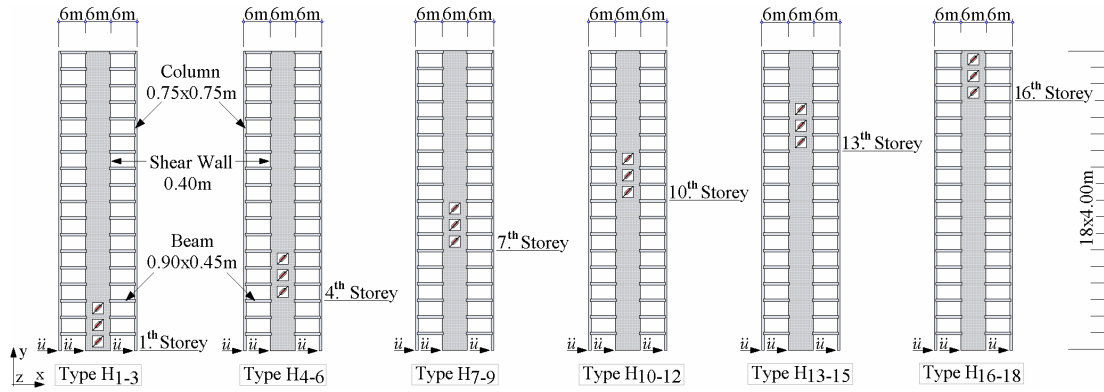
Placement of dampers within 18-storey frame-shear wall structures.
